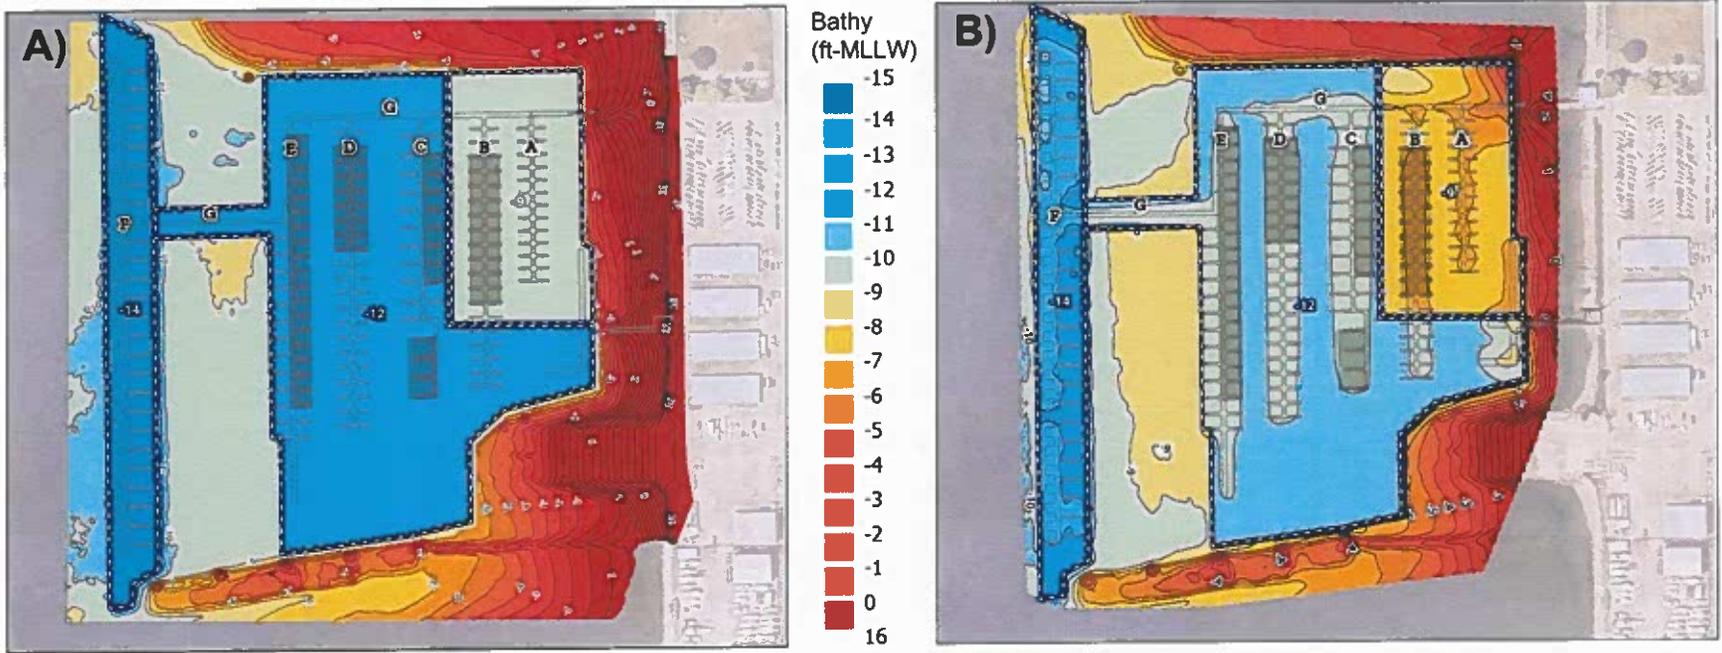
Alternative 2 Dredge Plan (A) and Dredge Plan Aged 10 years (B)
